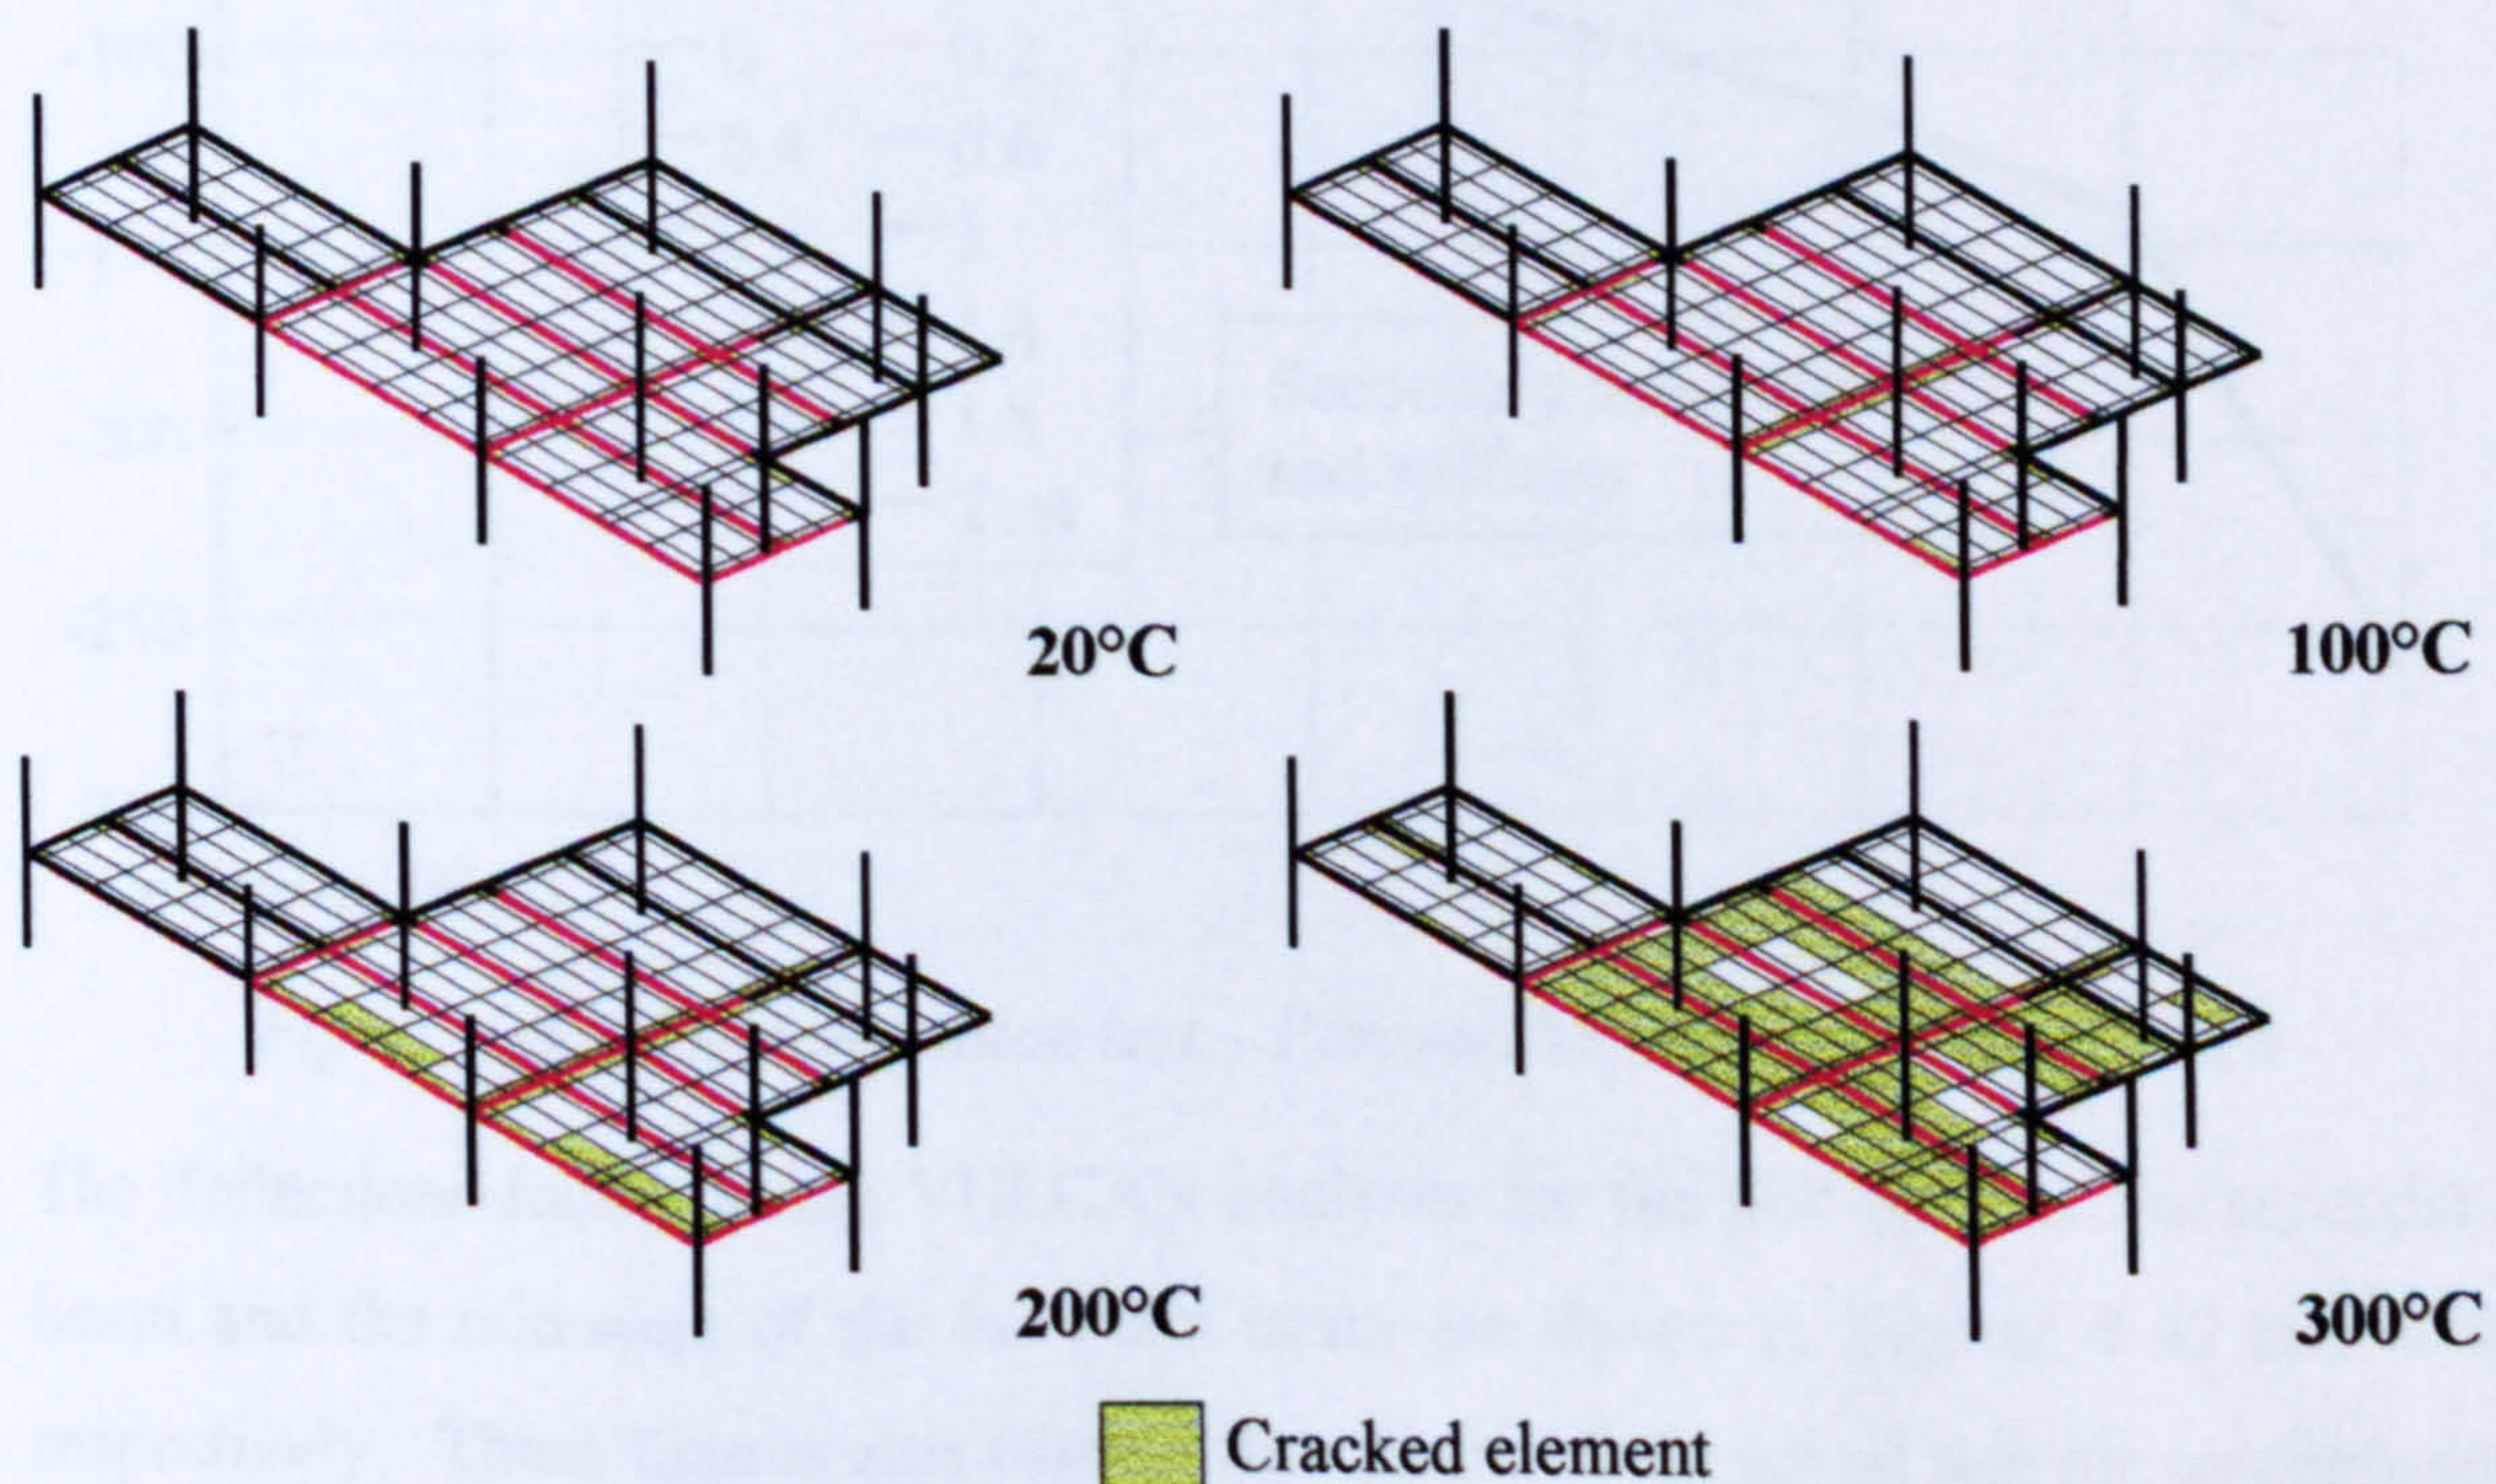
Large compartment demonstration test floor slab crack propagation
